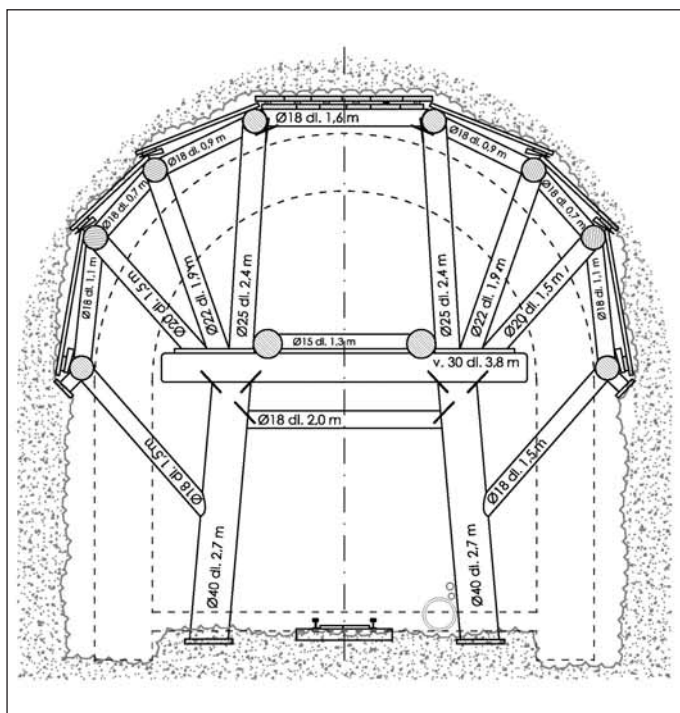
Fragments of excavation support in the underground of Stachelberg fortress. Joints between columns and main sills are formed by cramps and flat wedges. Longitudinal beams 30 cm in diameter lie on the main sills. Fans of braces complementing the truss fell down from the sills in the past
